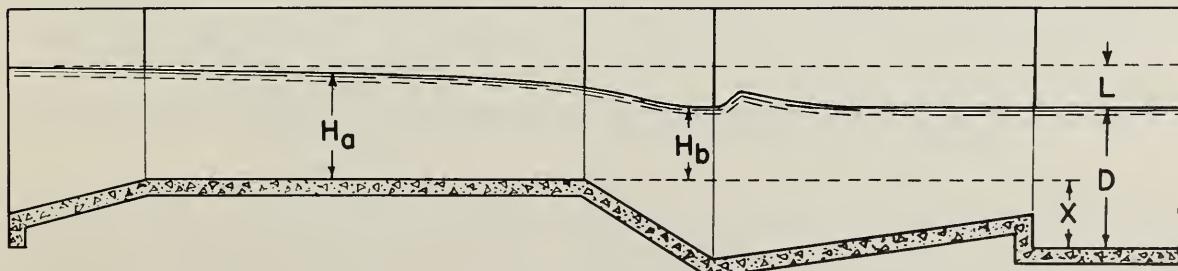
Section of a Parshall measuring flume illustrating the determination of the proper crest elevation
